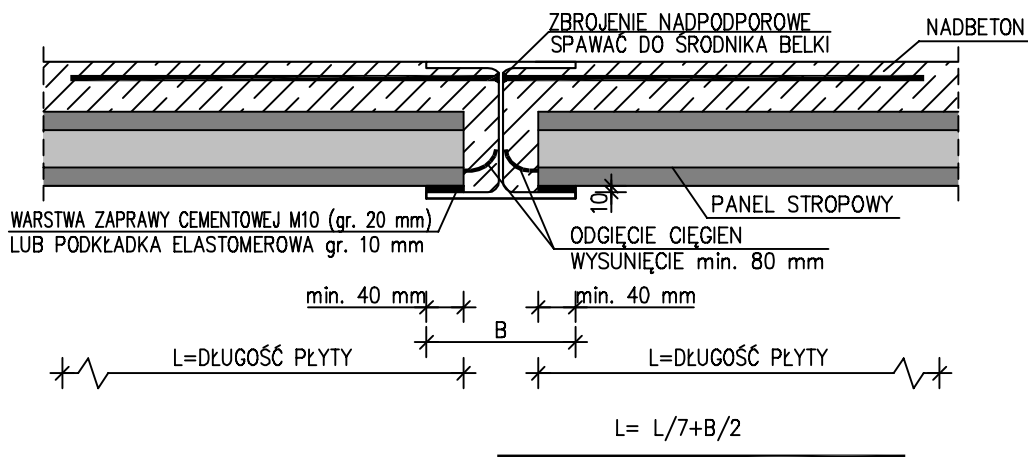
View of the Konbet S-Panel ceiling with protruding strands supported on a beam with panels based on the wall and SPK ceiling
